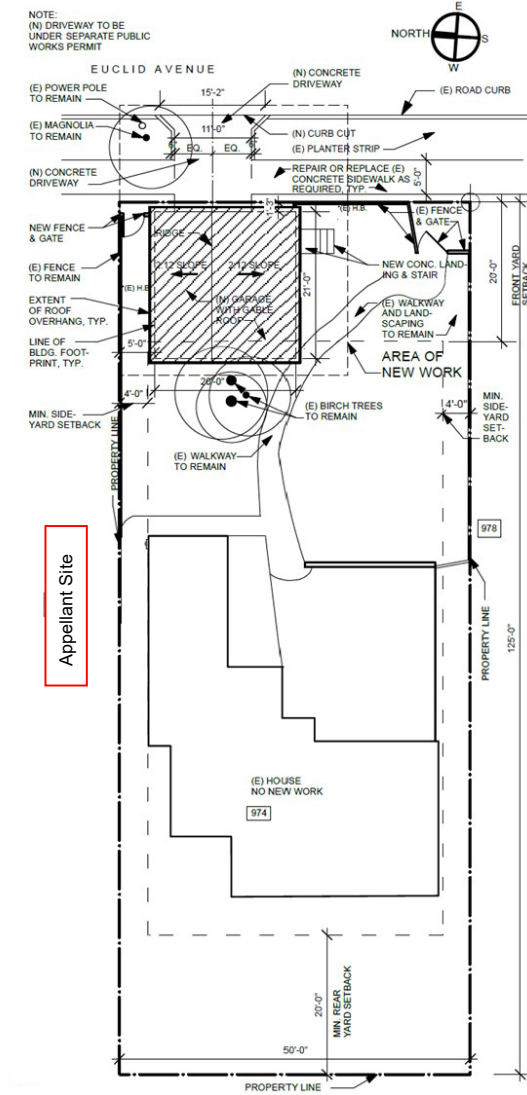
Site Plan – Proposed Accessory Structure (Garage)
